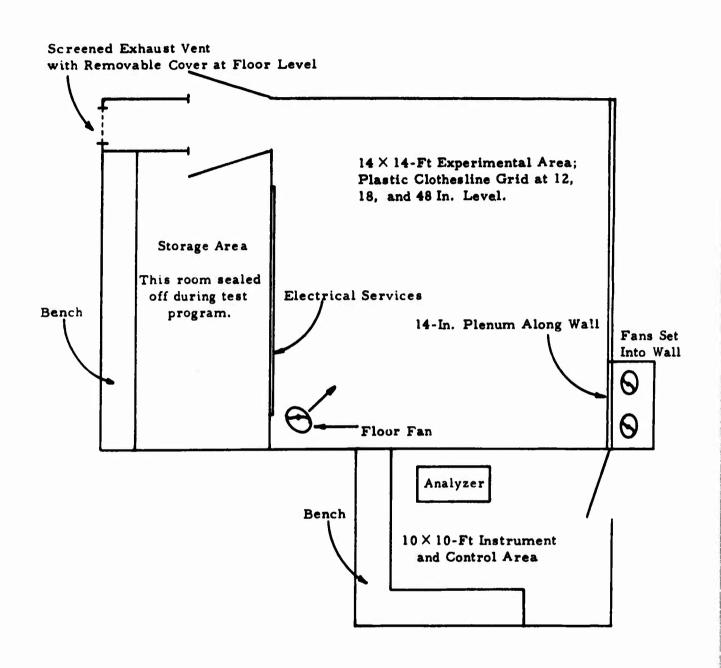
FLOOR PLAN-SIMULATED HANGAR SPACE
